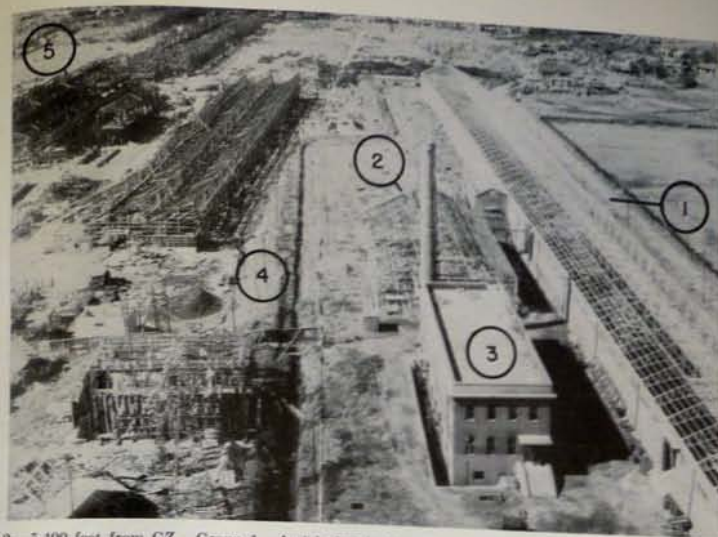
5,400 feet from GZ. Group 4. Aerial view looking west at north portion of Mitsubishi Torpedo Works.
